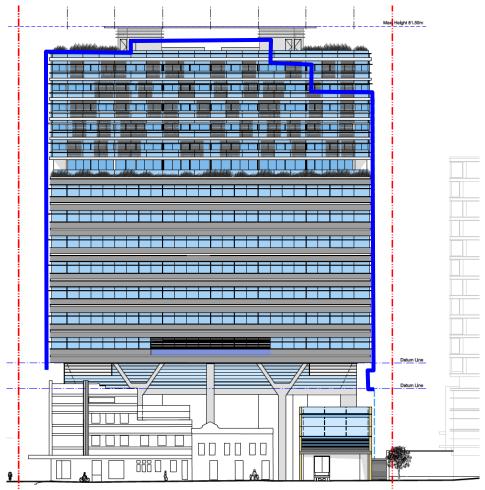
Extent of proposal against the concept plan envelope Source: Foster + Partners
